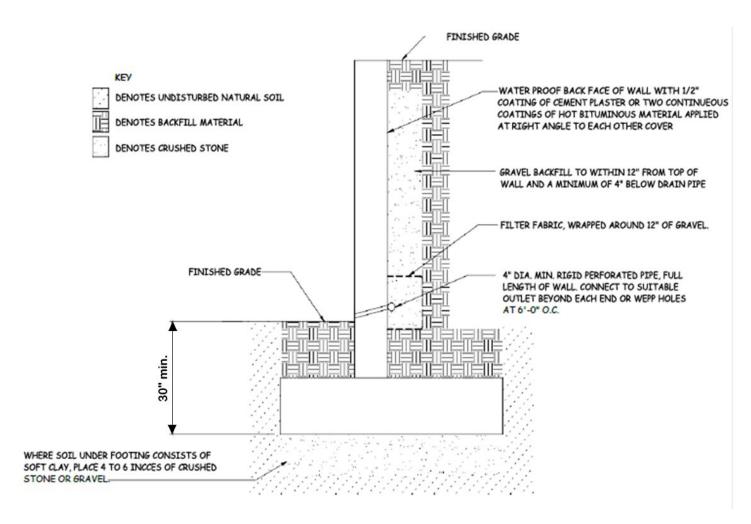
TYPICAL BACKFILL AND DRAINAGE DETAIL
